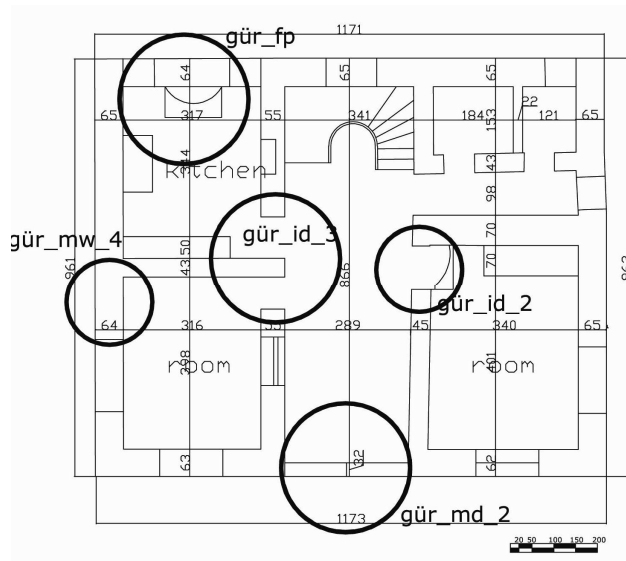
Ground floor plan of the Gürsoy House. Çelik, 2008.
